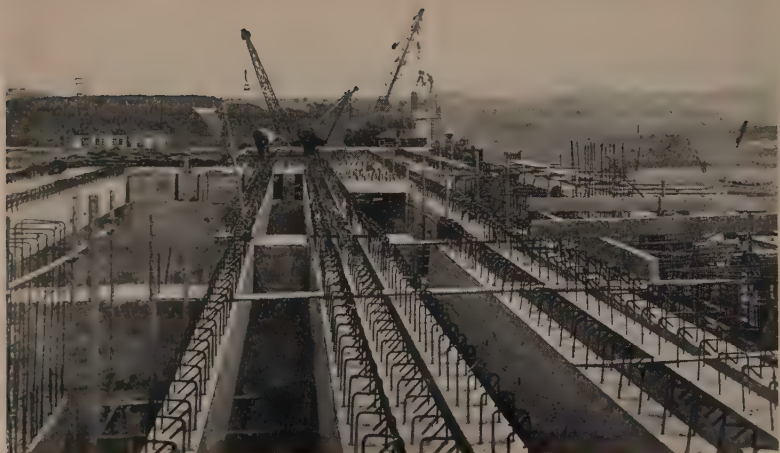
SERAPHIM IRONWORKS DEVELOPMENT SCHEME. PRECAST CONCRETE BEAMS AND SLABS ON THE OPERATING FLOOR OF THE PRIMARY CRUSHING PLANT
